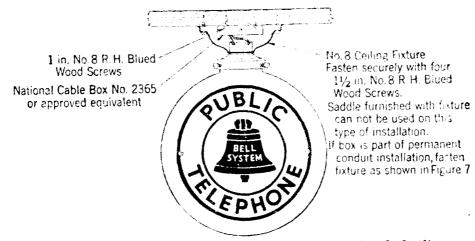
Installation of No. 8 Sign on Wood Ceiling
